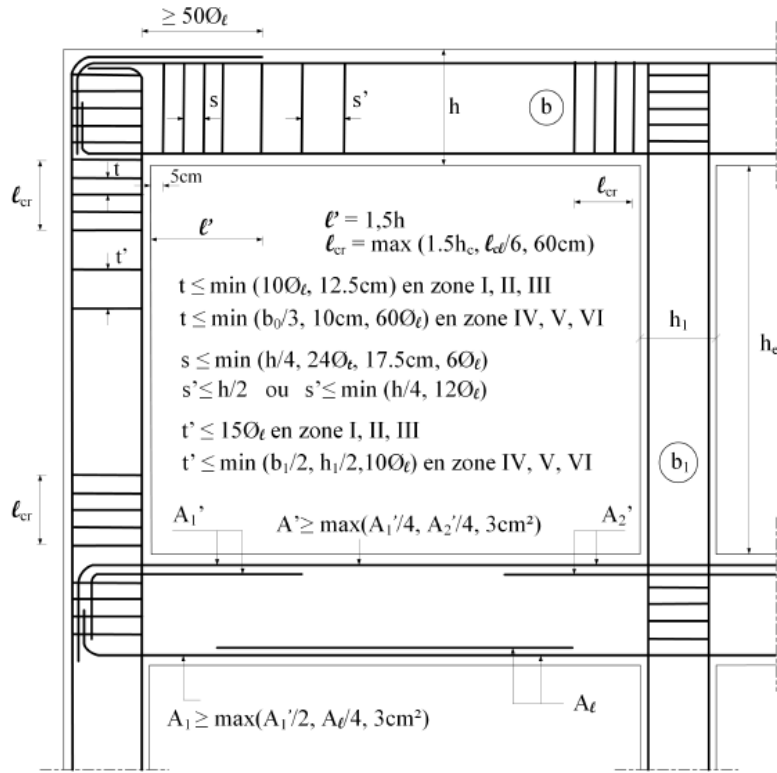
Reinforcement detailing of a RC beam (partially adopted from RPA2024) [4].
